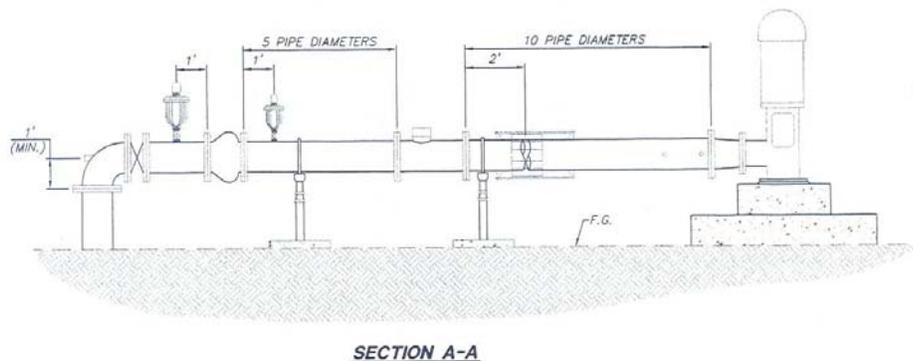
, Example of Typical Above-Ground Discharge Piping Detail
